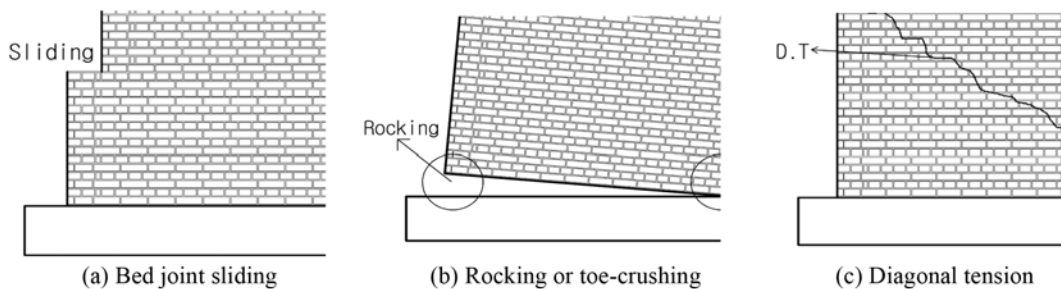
Failure mode of unreinforced masonry wall
